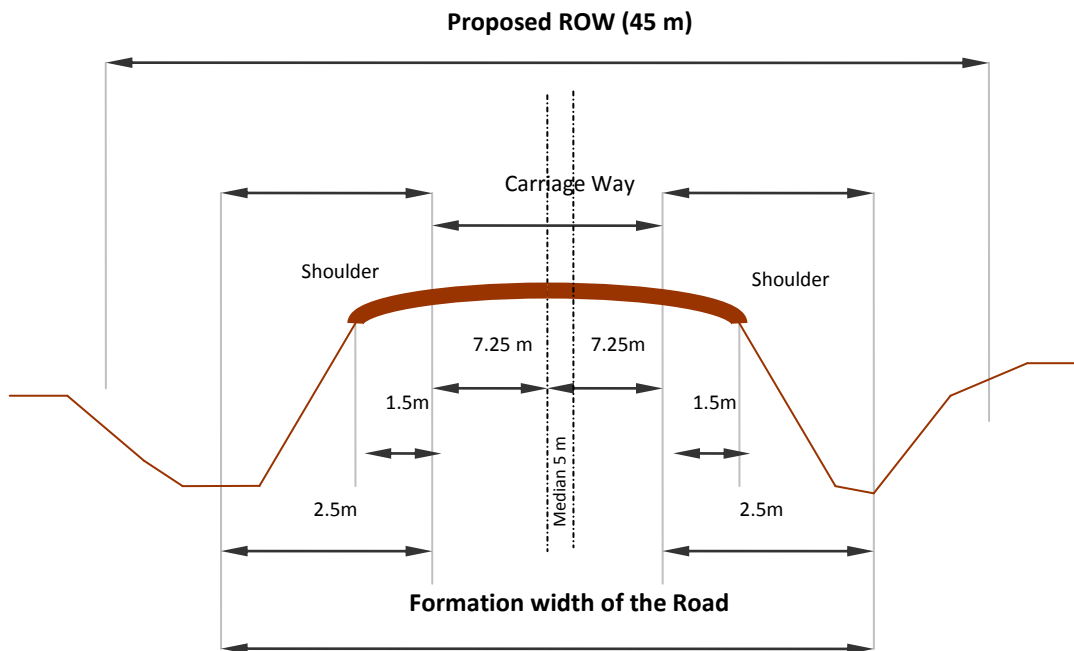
A cross section showing a typical Formation width of the Bypass Road
